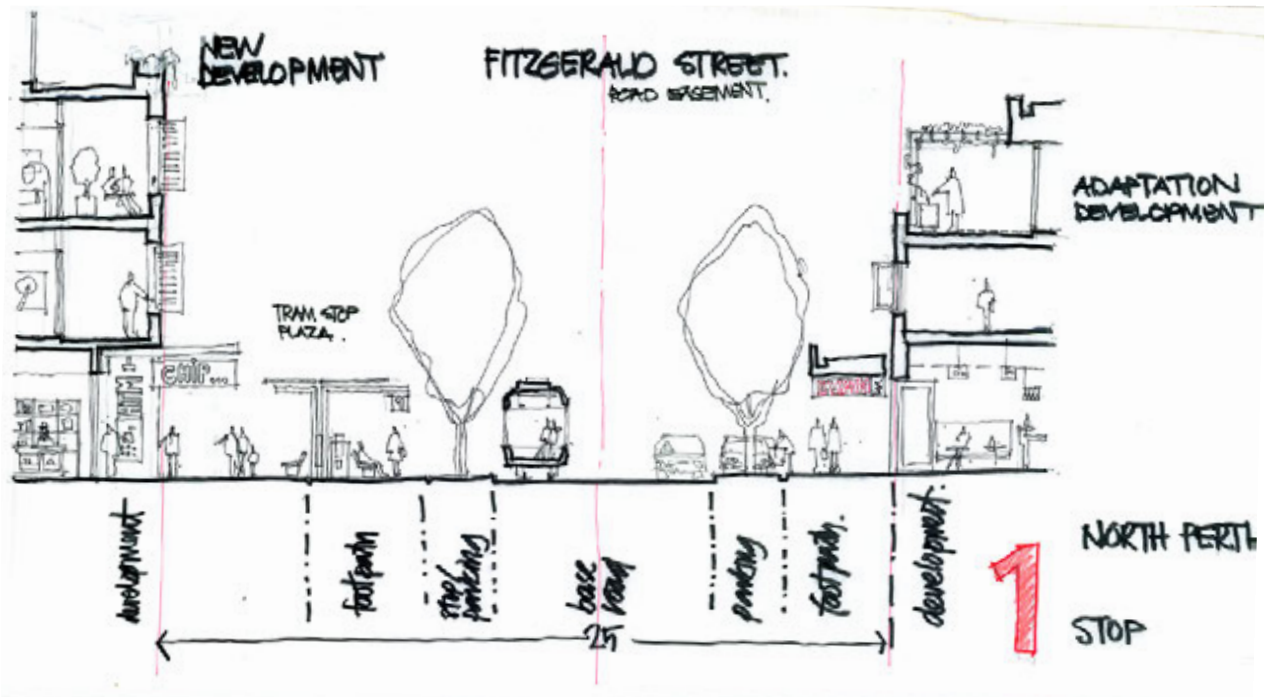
Portal or gateway development proposed, corner Grosvenor Avenue and Fitzgerald Street – Section
